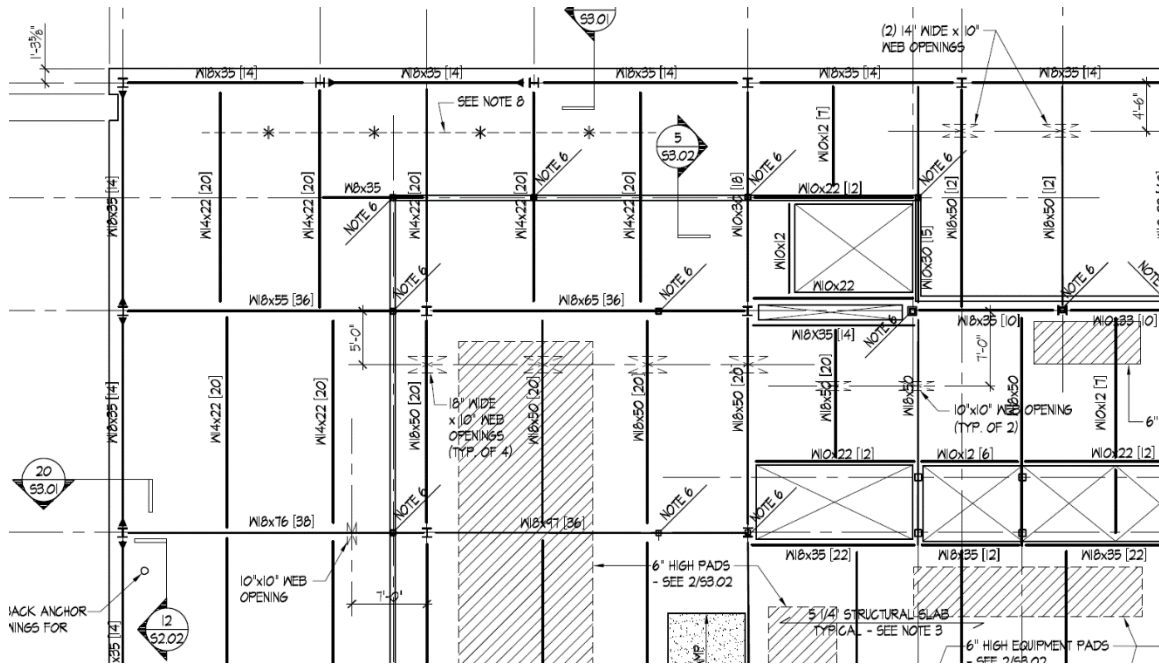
| Partial Main Roof/Penthouse Framing Plan
